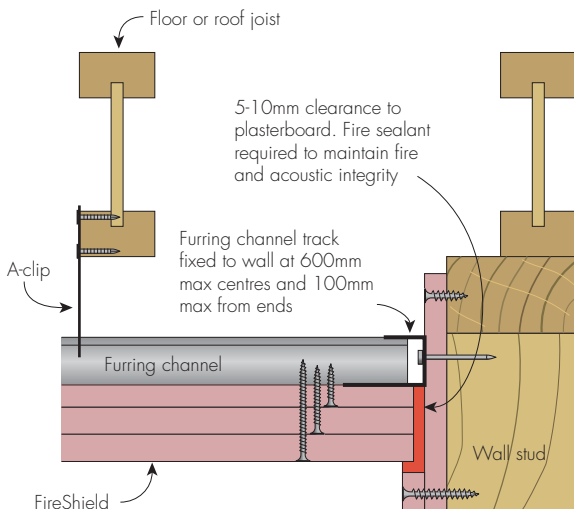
Fire Rated Ceiling to Wall - Alternate Detail
